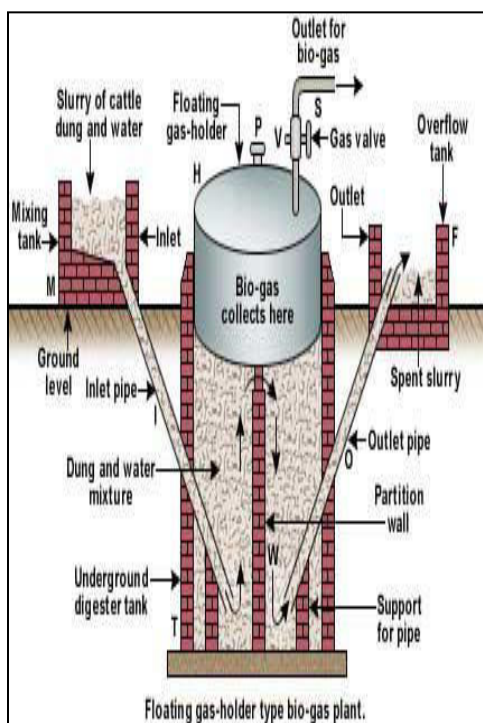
FLOATING DOME TYPE BIOGAS PLANT
